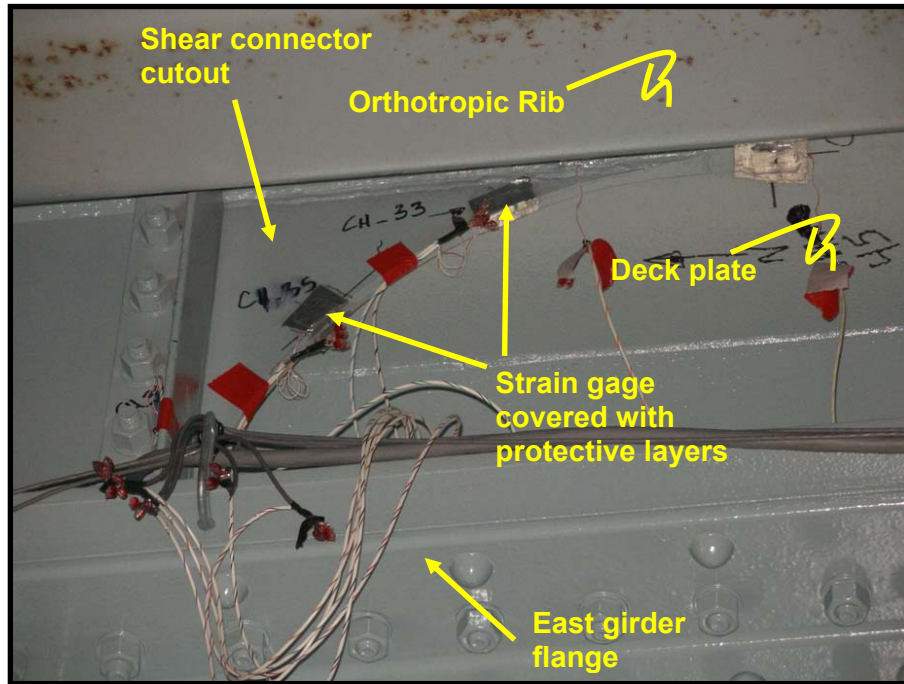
Strain gage CH_33 and strain gage CH_35 installed at the cutout detail on the south end of the web plate of the north shear connector attached to the east girder in Span 45
